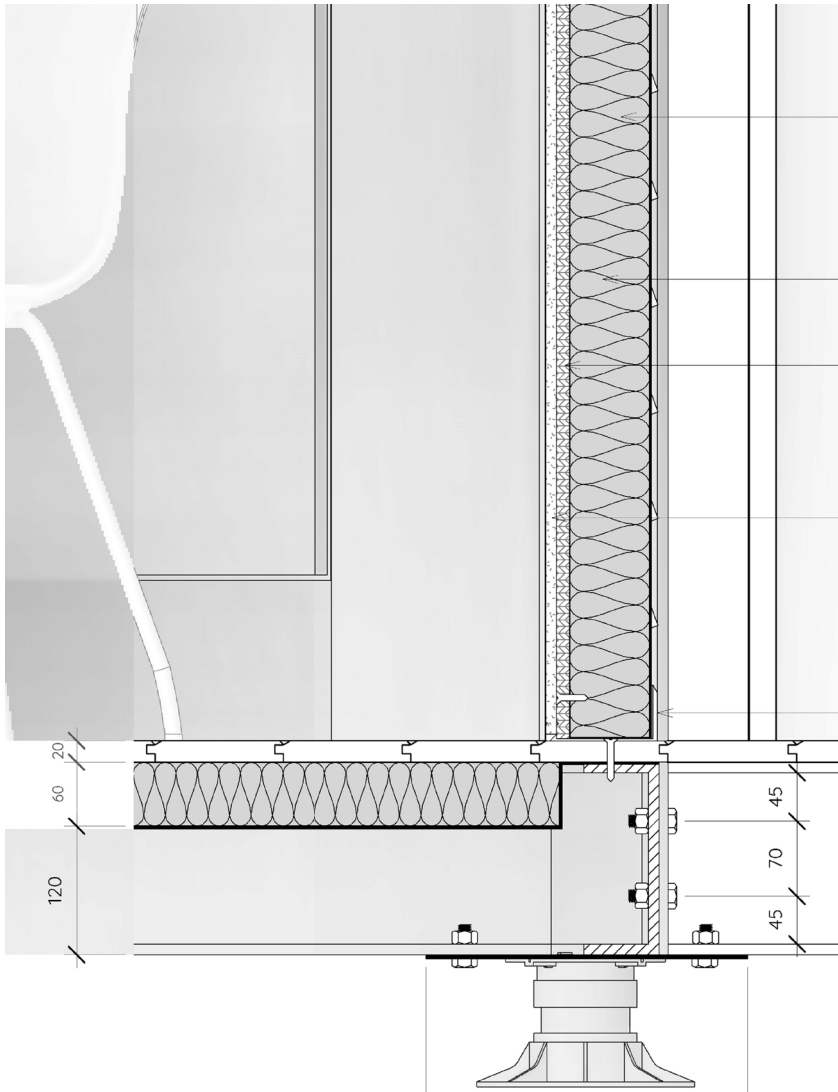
## DETAIL B \_ FLOOR - STRUCTURE CONNECTION
